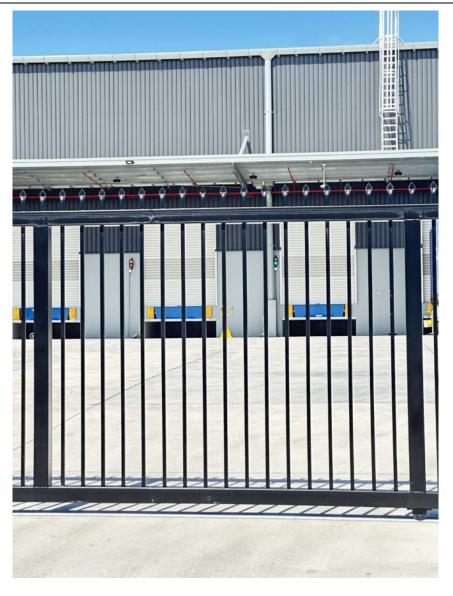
6 Roller doors that can be used for cross ventilation at warehouse N1
